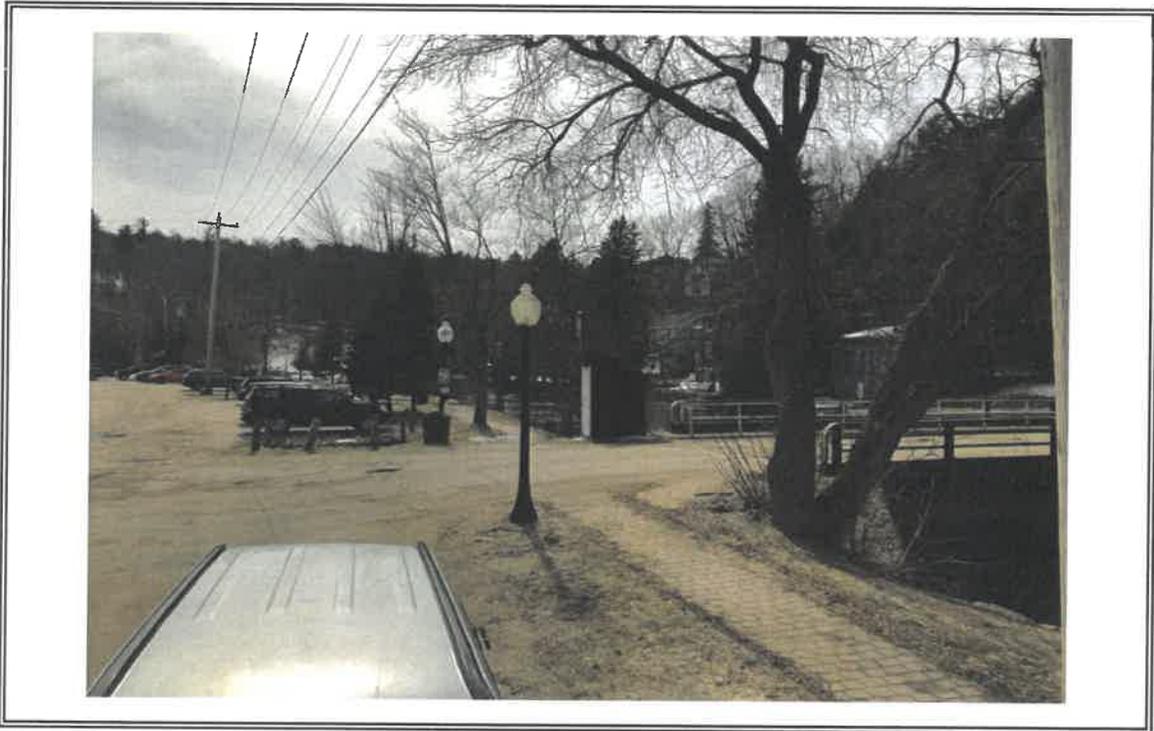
Alt. 2 - Looking south, existing Riverwalk and Dorsey Street bridge
